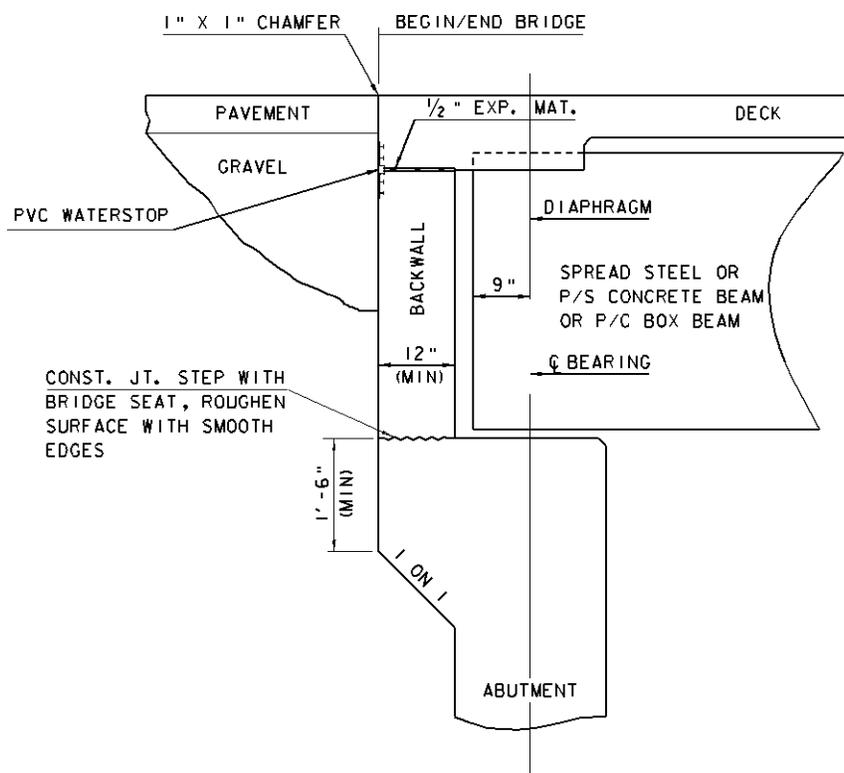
1 Type I – Expansion and Fixed Bridge Ends for Long Span Spread Beam Decking without Approach Slabs of any skew or for the Expansion End of Butted Box Beam Decks with skews greater than 30°.
